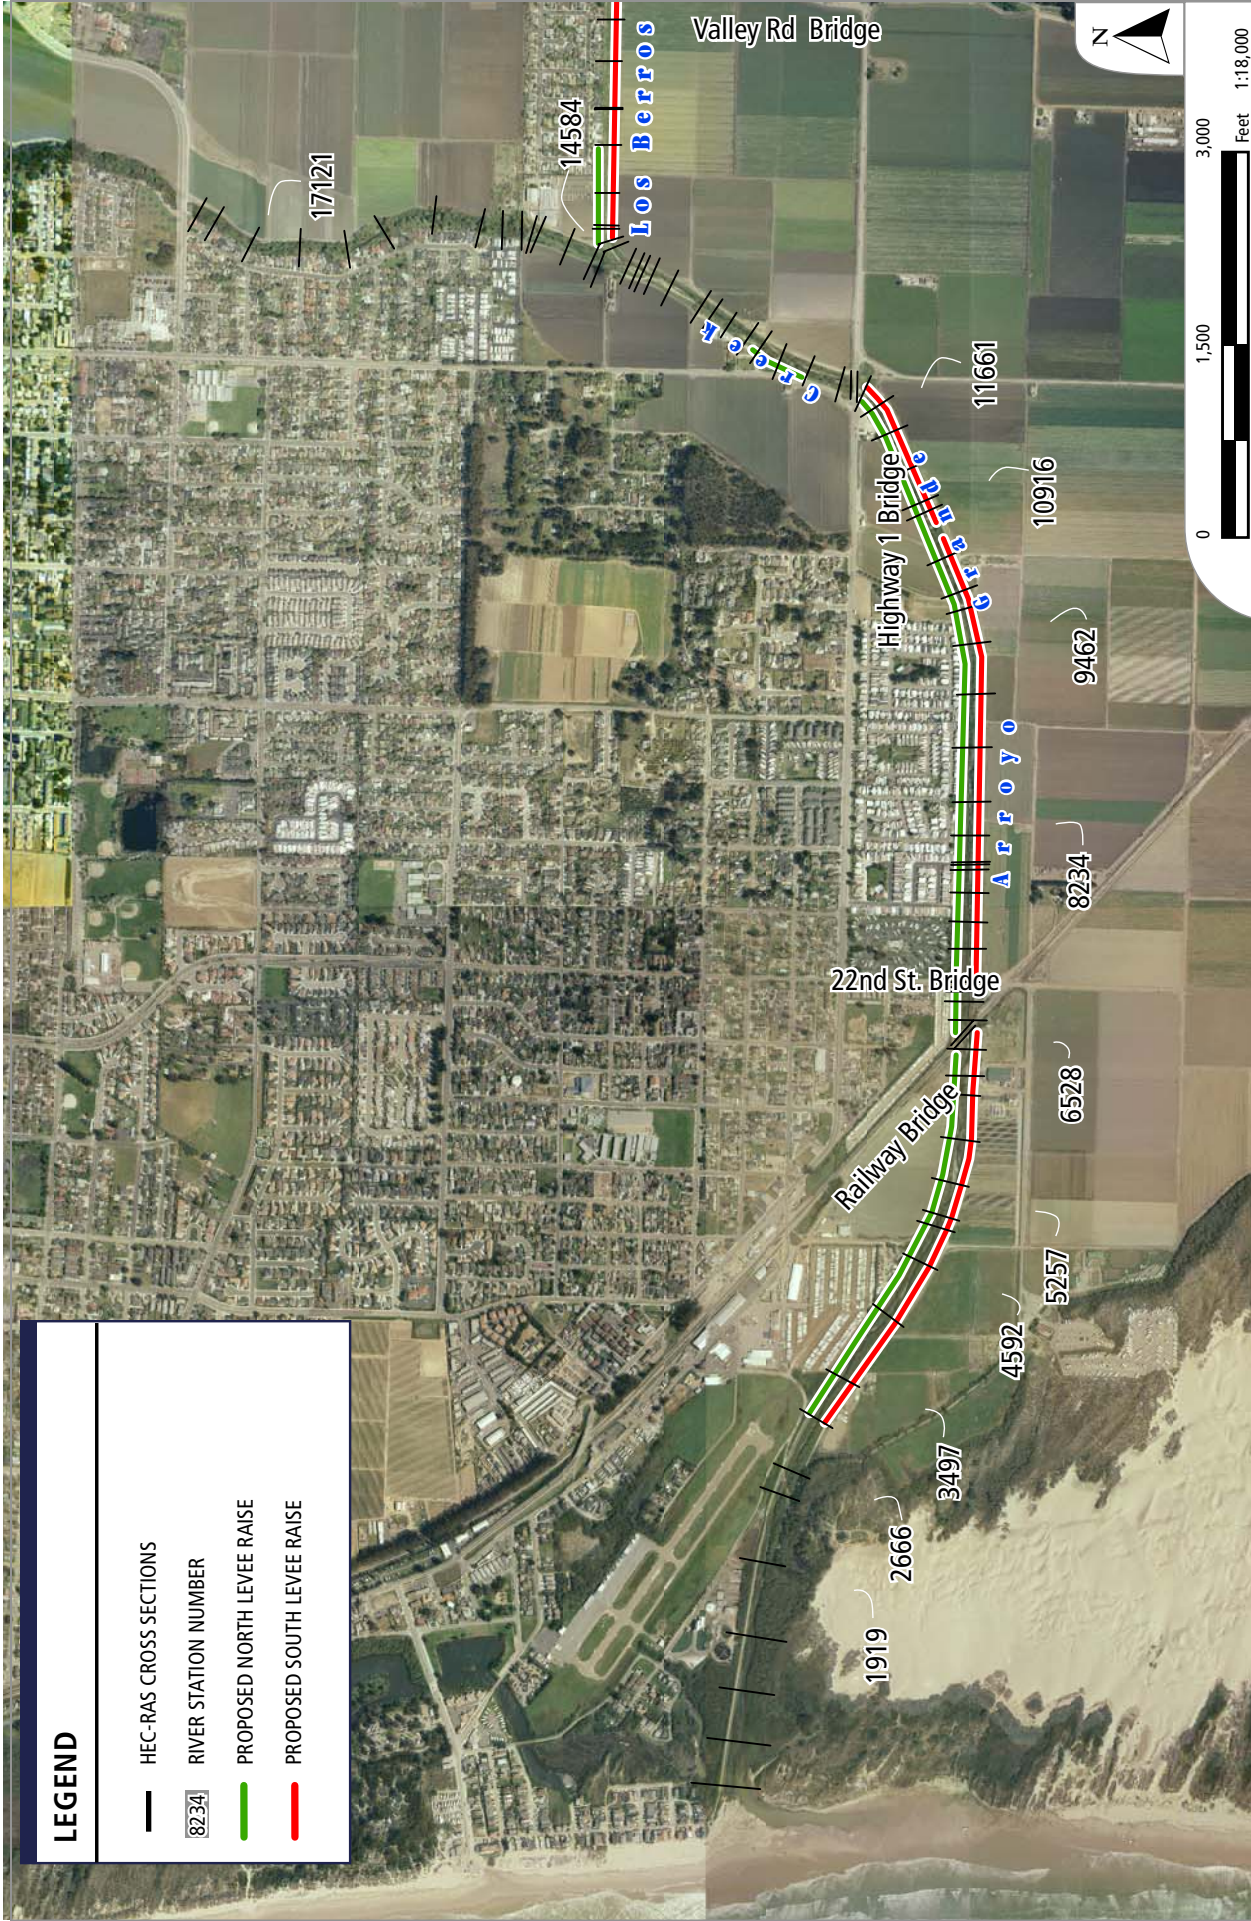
Plan view of levee raise locations for Alternative 3b - Levee Raise (15-year protection). Under this alternative, levee raising occurs from the Highway 1 Bridge downstream to the airport on the mainstem Arroyo Grande with a portion of the Los Berros levee raised.
